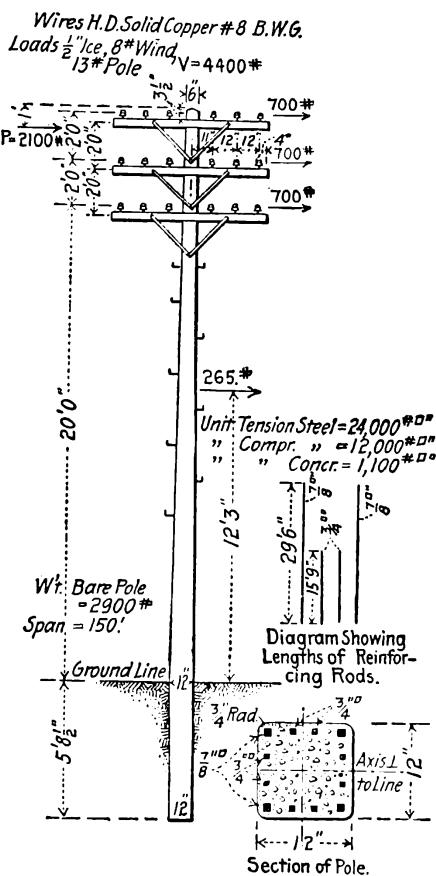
A.—A 30-ft. reinforced concrete pole (Universal Portland Cement Co.).
